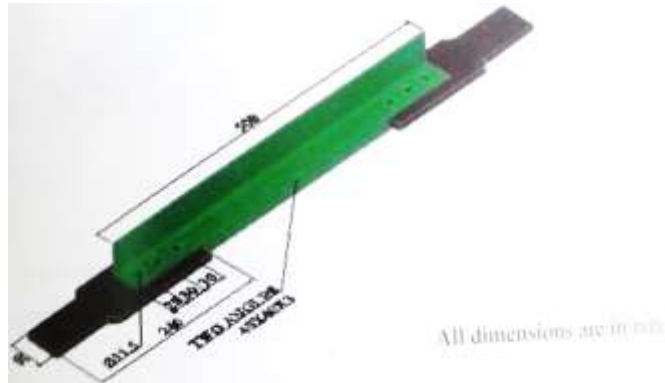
Details of double angle specimen connected to opposite side provided with bolts in single row
